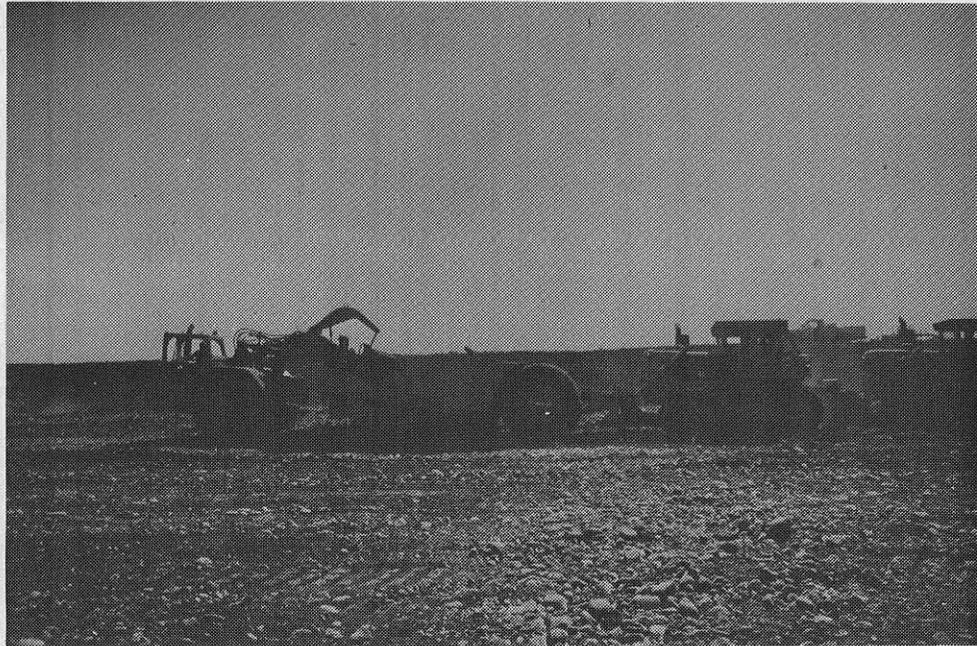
Foundation excavation using two push cats and scraper. April 1984
